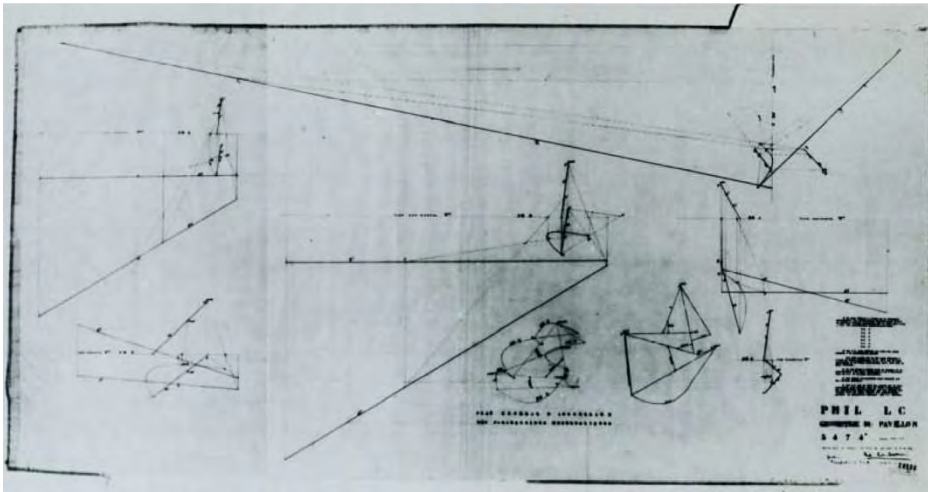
Geometrical drawing representing the hyperbolic paraboloids.
